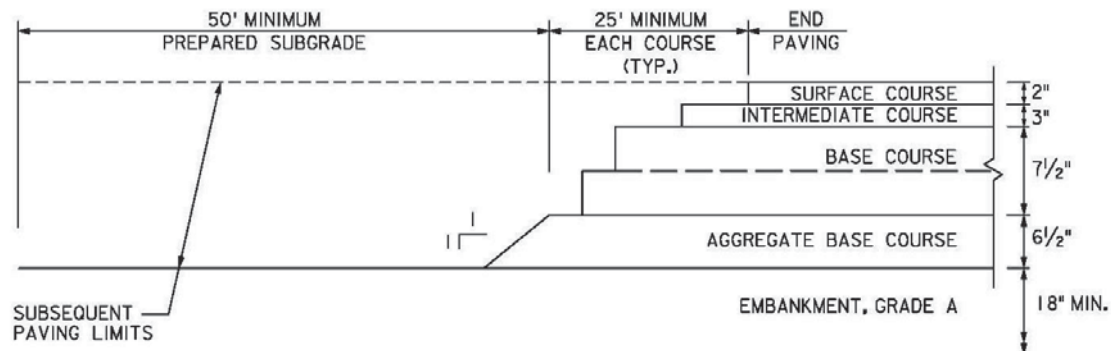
Turnpike New Pavement Interface with Existing Pavement
